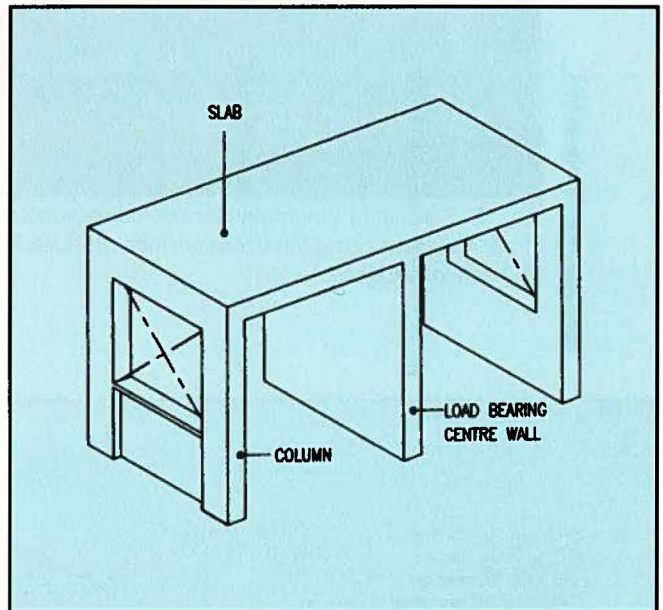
System 2 modified M Volumetric consisting of two column frames and one center partition wall with linking slab element.
